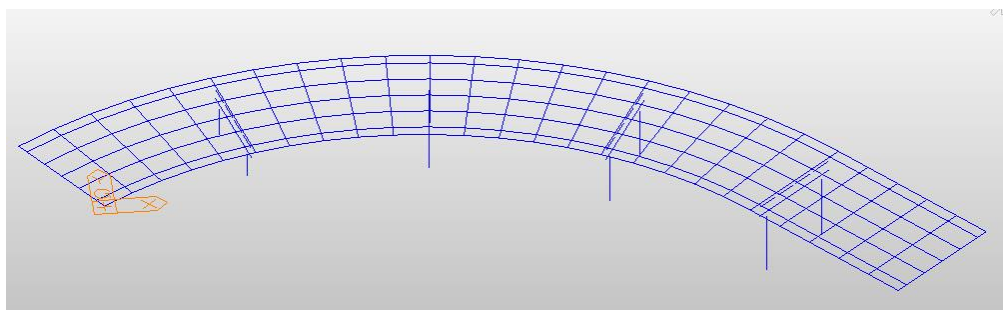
Grillage model used for the Structural Assessment of Ashworth Viaduct
